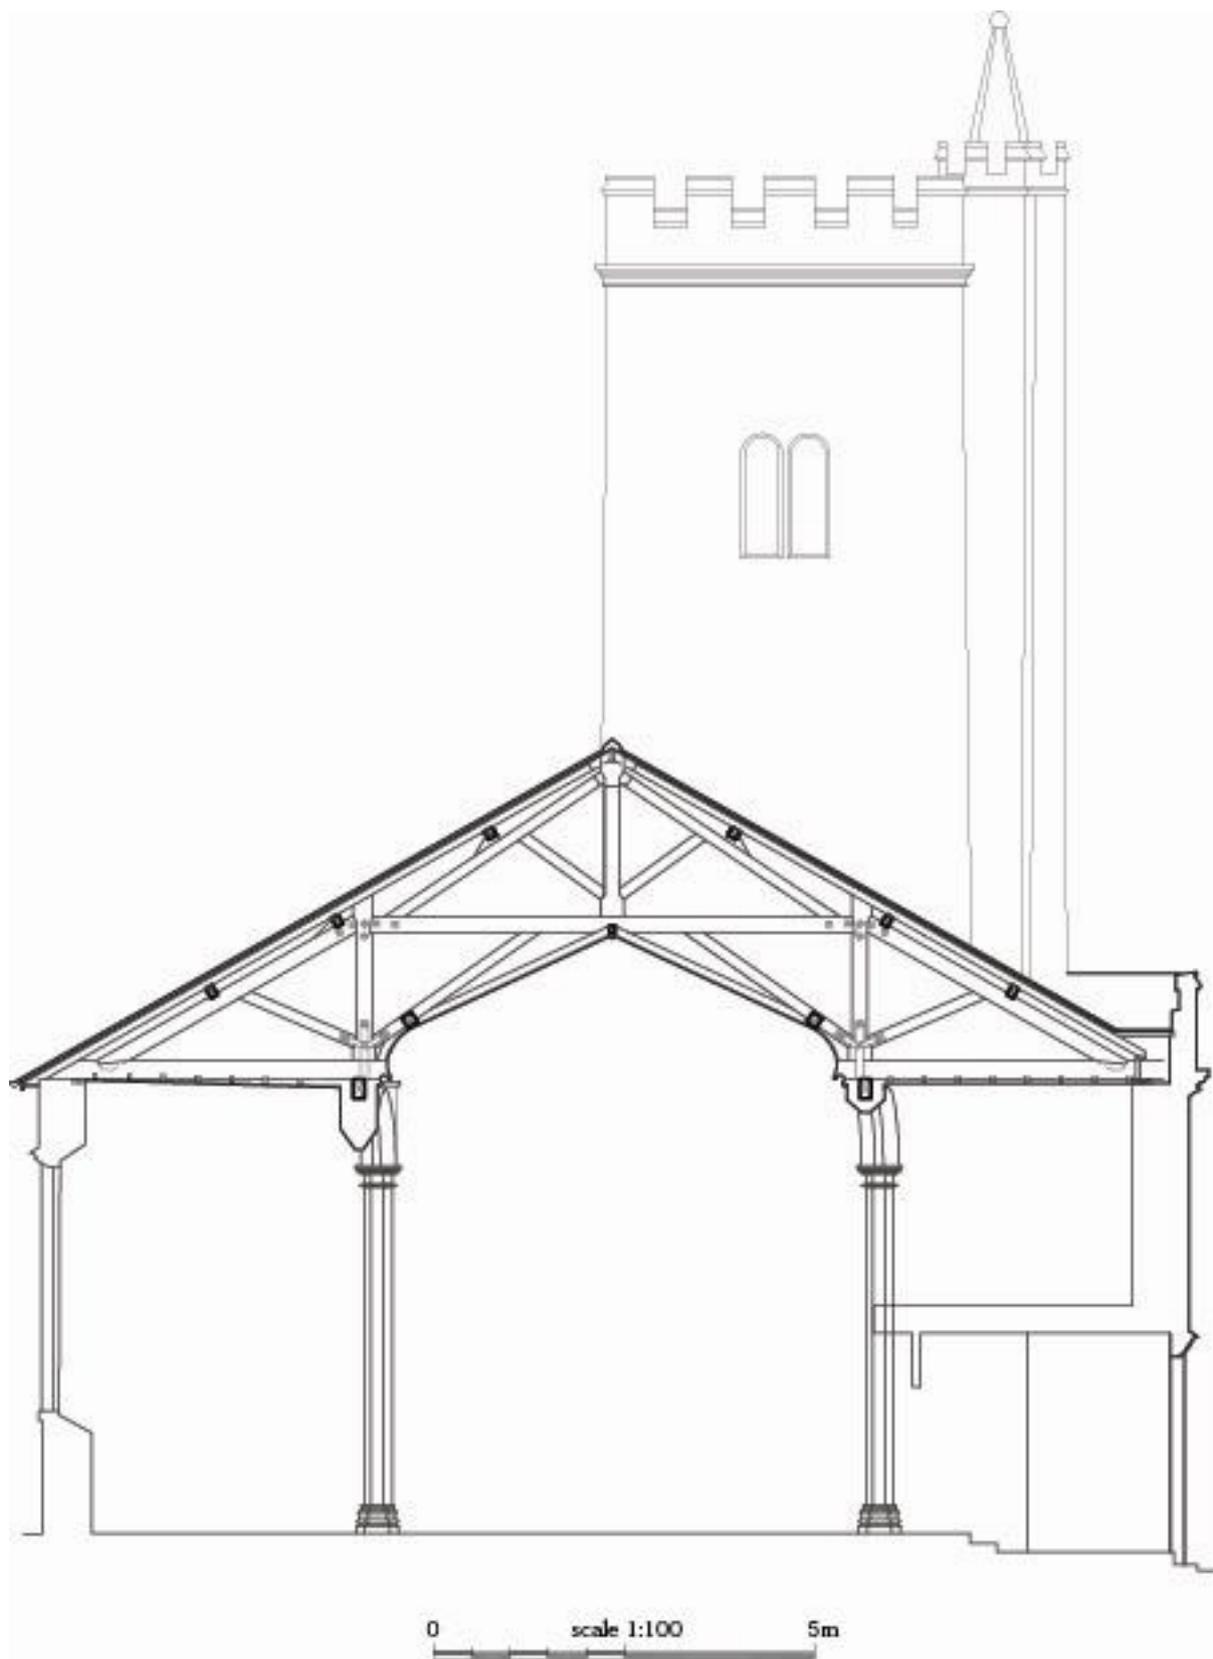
Section across west end of nave, showing phase 8 roof (1826).
